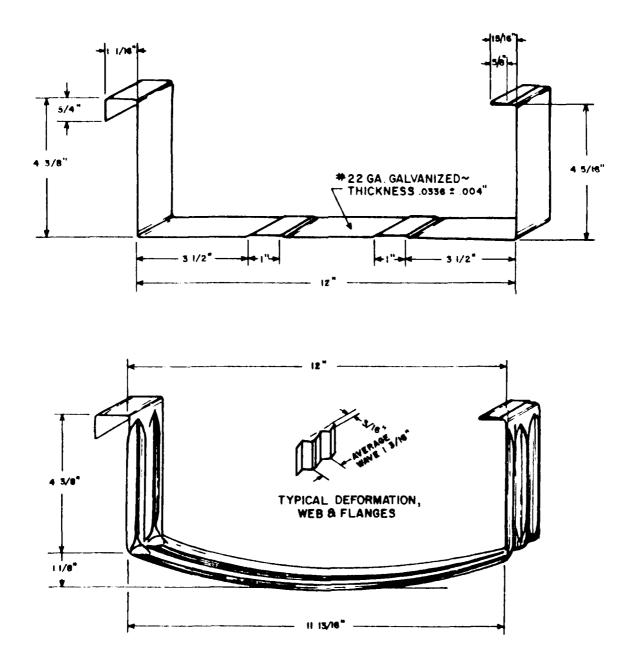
Roll-formed cross sections of the (a) straight and (b) curved K-Span panels.
